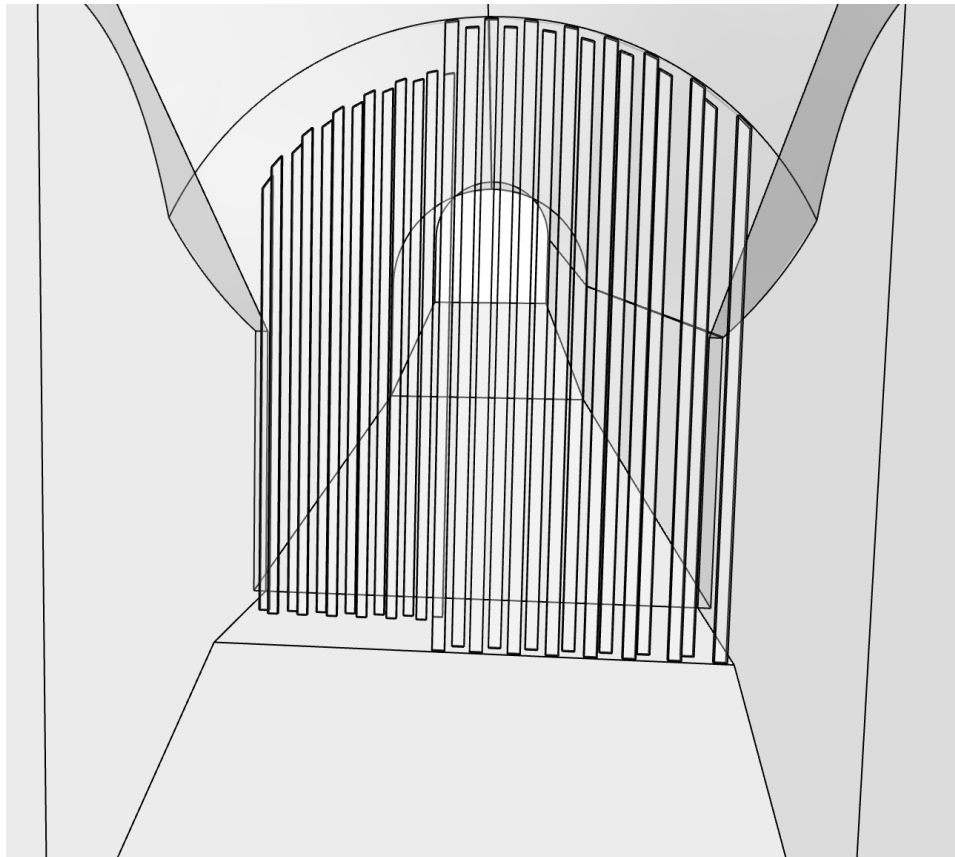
Side walls as diffusor extension in addition to bottom ramp plus double row squared calming piles with 20/20 cm distance 40 cm, view from inside
